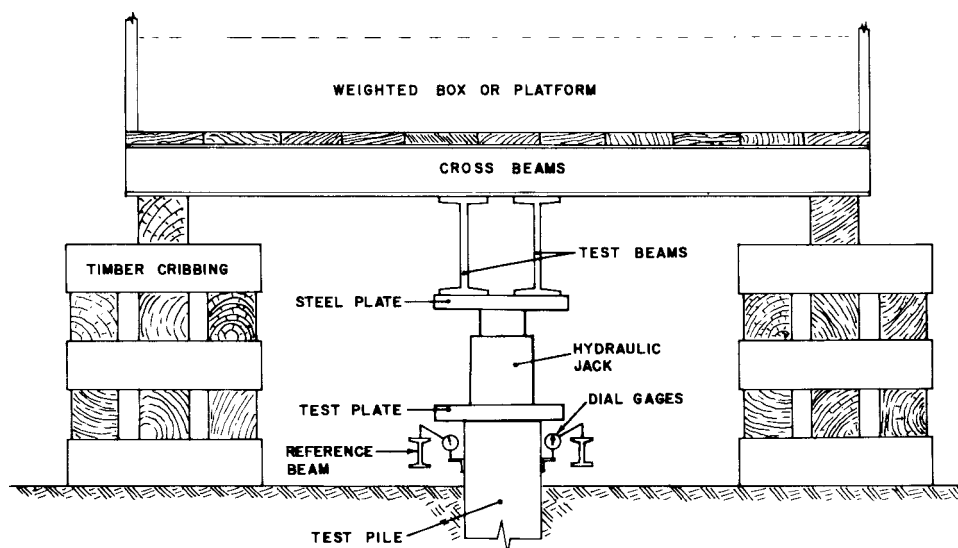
Schematic Setup for Applying Loads to Pile Using Hydraulic Jack Acting Against Weighted Box or Platform
